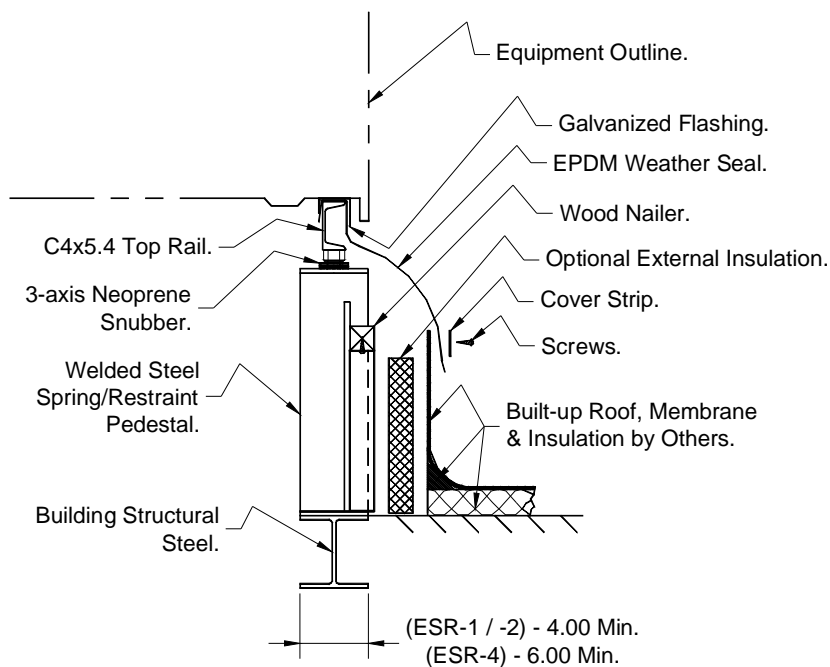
; Typical Cross-Section Through an ESR Pedestal Installation.
